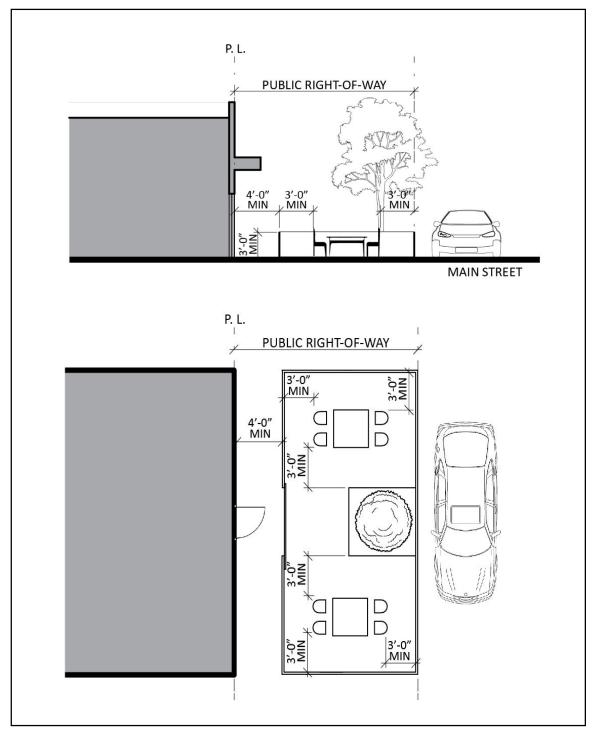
Example of an outdoor dining area in the public right-of-way with a barrier.
